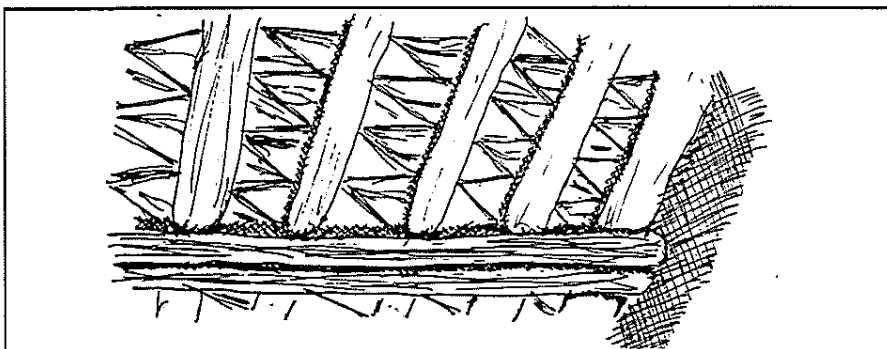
A ceiling consisting of palm leaves laid on palm trunk joists.
